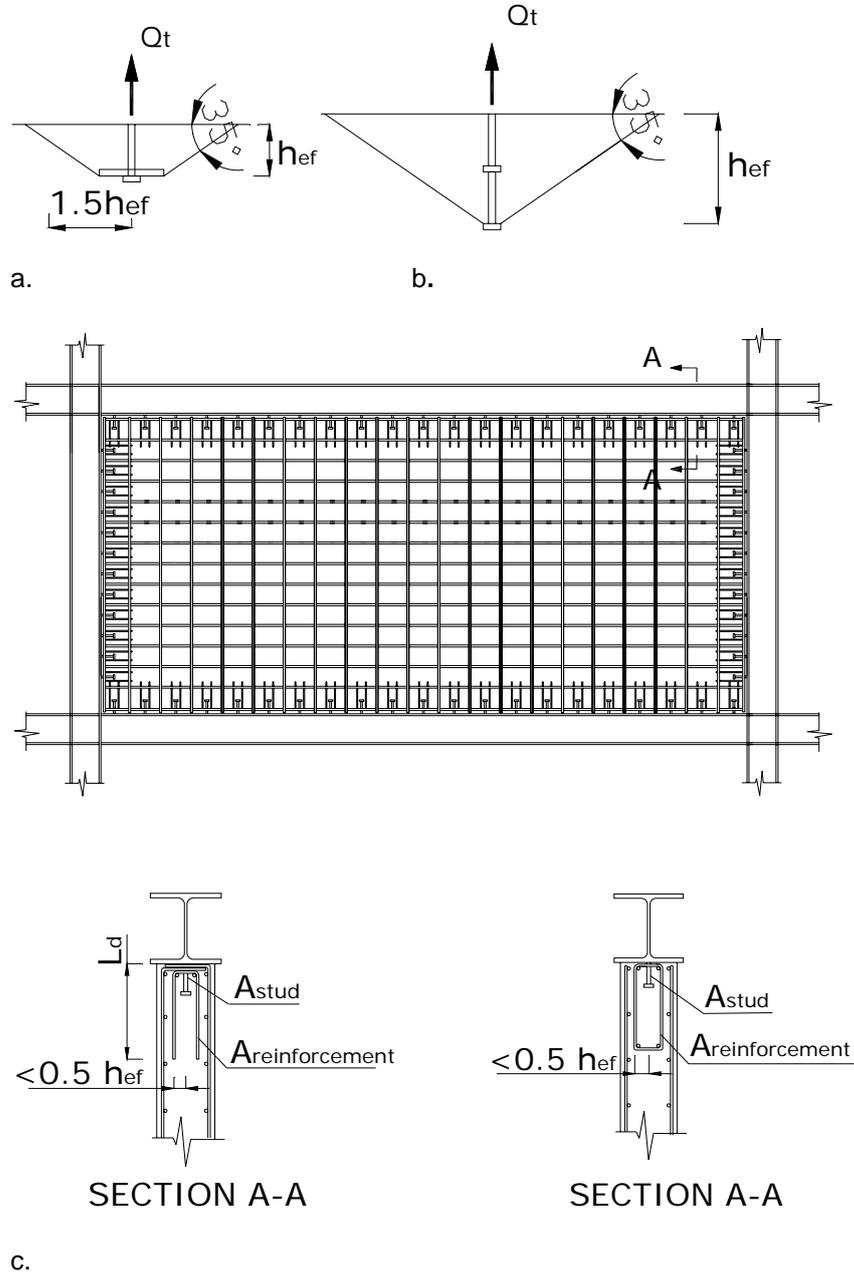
Details to improve the strength of concrete in tension: a) circular plates; b) welded studs increasing the effective embedment; c) supplementary reinforcement.
